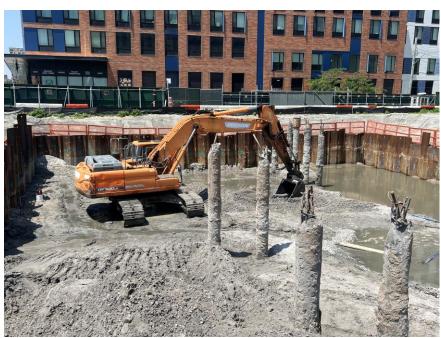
Precise excavating non-hazardous soil/fill in the southwestern part of the site (facing west).
